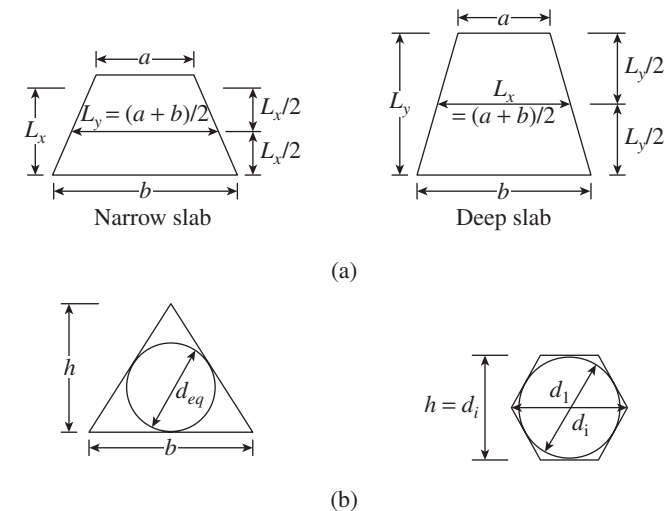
Non-rectangular slabs (a) Trapezoidal slabs (b) Polygonal slabs
